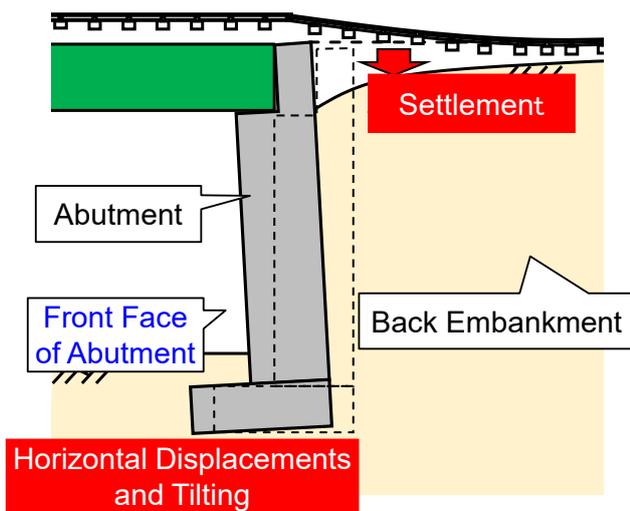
Example of Damage to Bridge Abutment in Past Earthquakes
